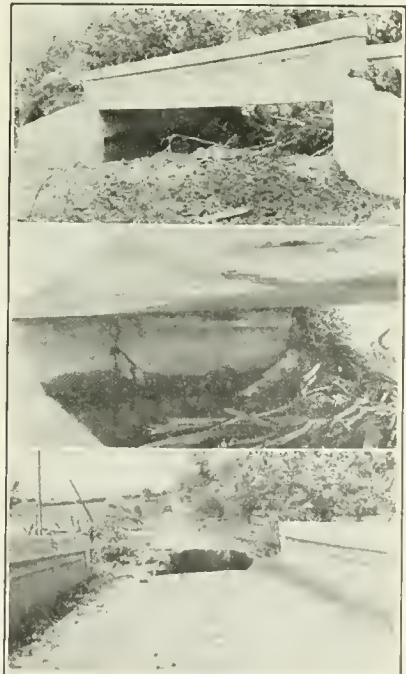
REINFORCED CONCRETE BRIDGE, 40 FT. SPAN, 16 FT. ROADWAY, BUILT IN 1916 ACCORDING TO PLANS APPROVED BY THE ILLINOIS DIVISION OF HIGHWAYS, FAILURE OCCURRED IN JUNE, 1920.
